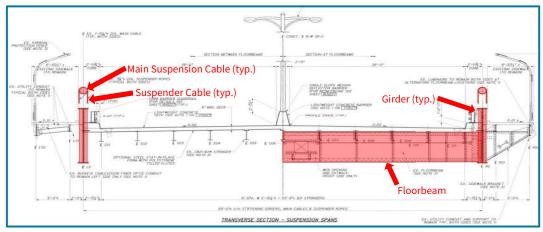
Typical Main Suspension Spans section. NSTMs are highlighted in red.
